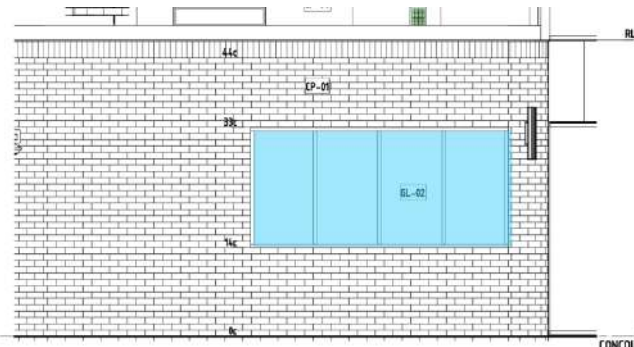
ELEVATION OF THE SHARED STAFF CRIB FROM THE SOUTH-EAST
